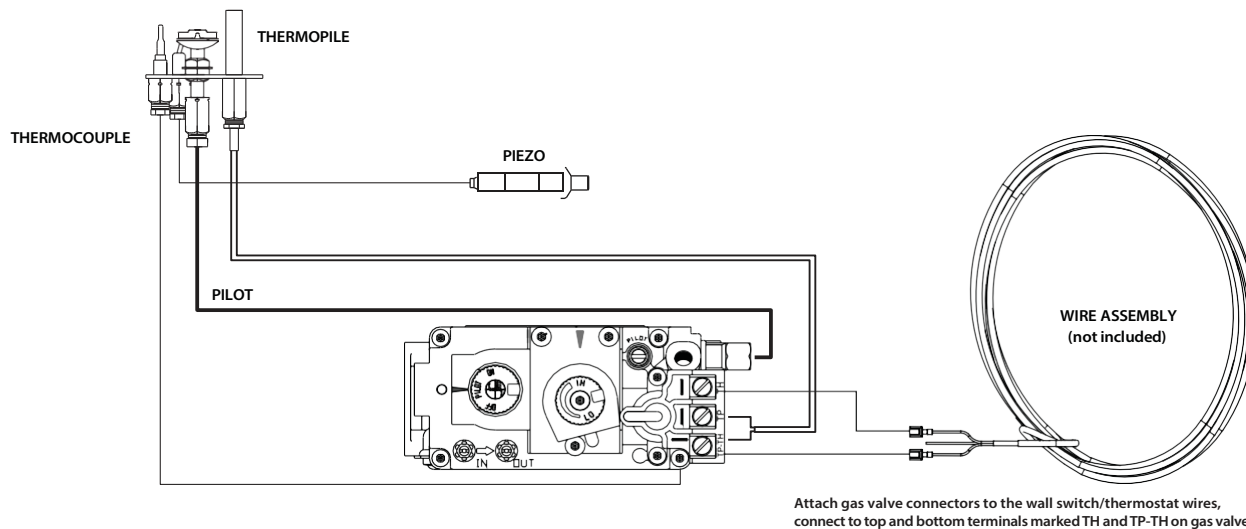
, OAK18-MV Gas Valve Wiring Schematic with Thermostat or Wall Switch
